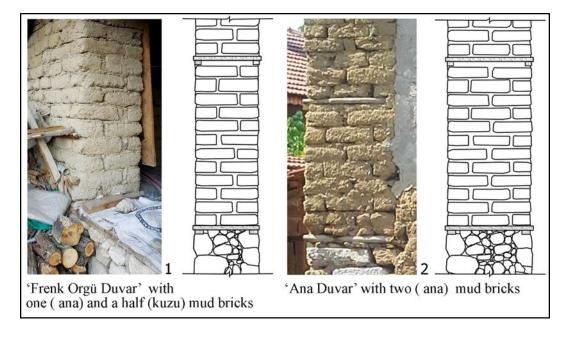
Mud brick masonry wall types of traditional houses in Ağlasun. First photo is from H15 and second one is from H5.
